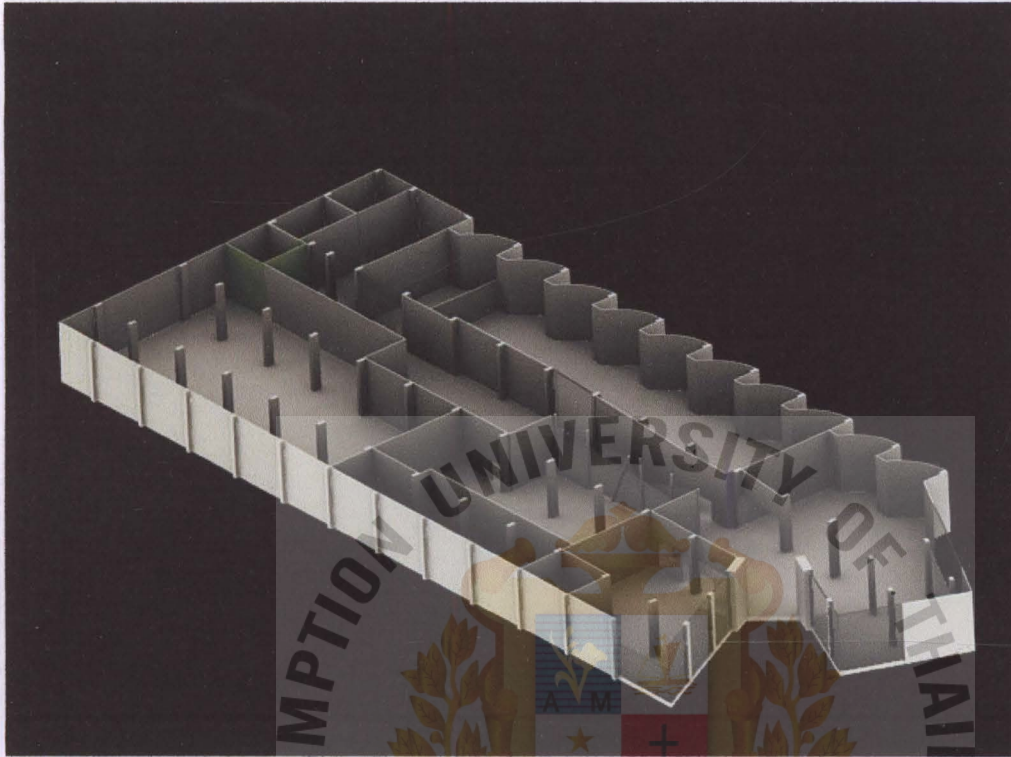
Space Model 1<sup>st</sup> Floor
